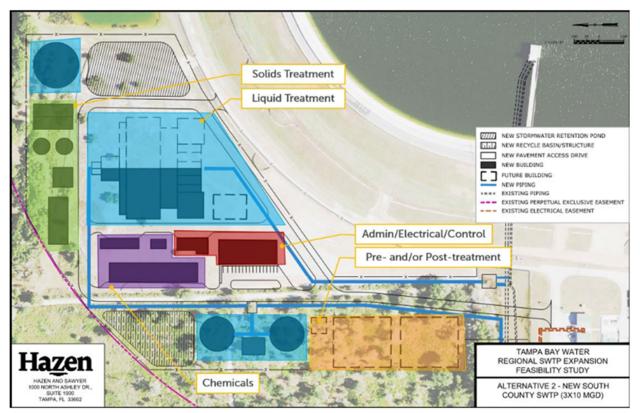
Conceptual Site Plan for New Surface WTP Near the Reservoir
